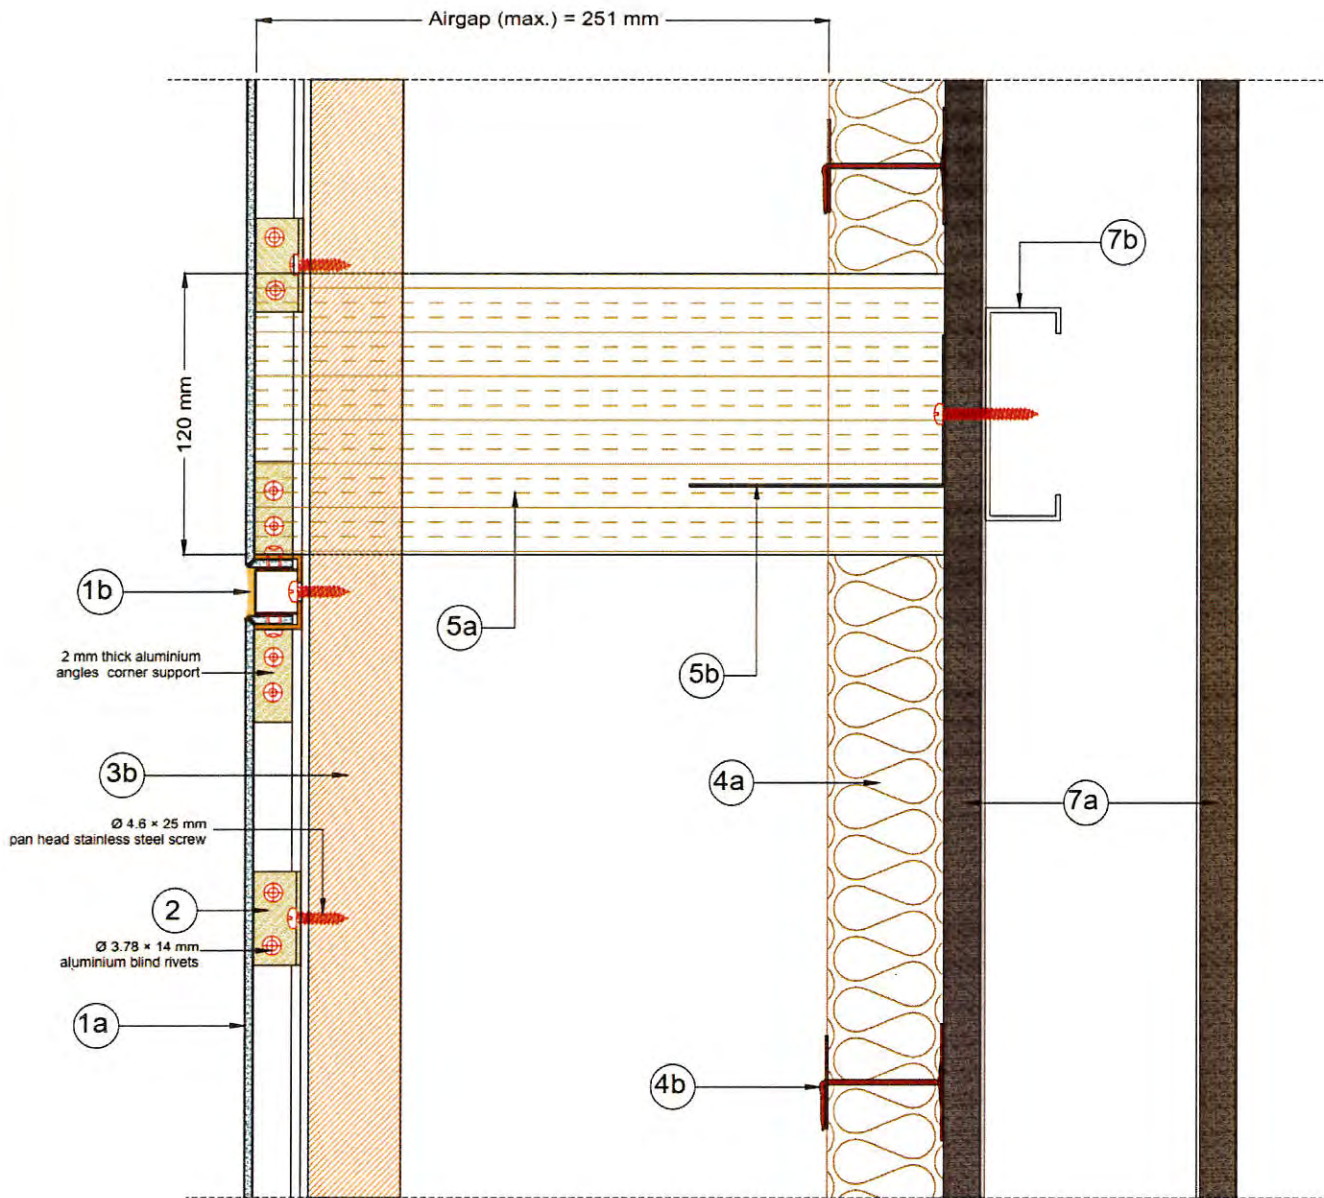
"Emerge U.K. FR A2" 4 mm thick Aluminium Composite Material Exterior Wall Cladding Assembly vertical section joint details
